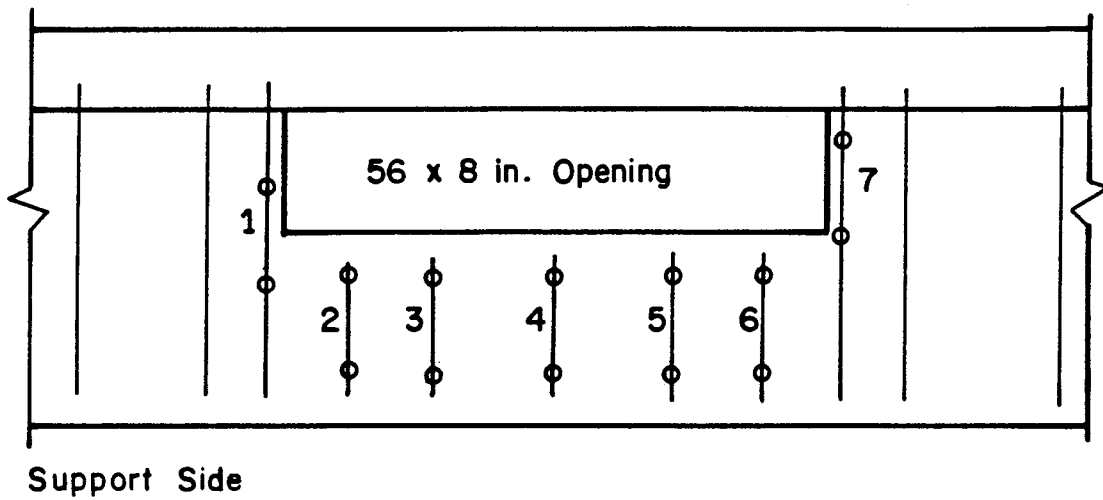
Demec Points on stirrups - BEAM B1 and BEAM D1.
